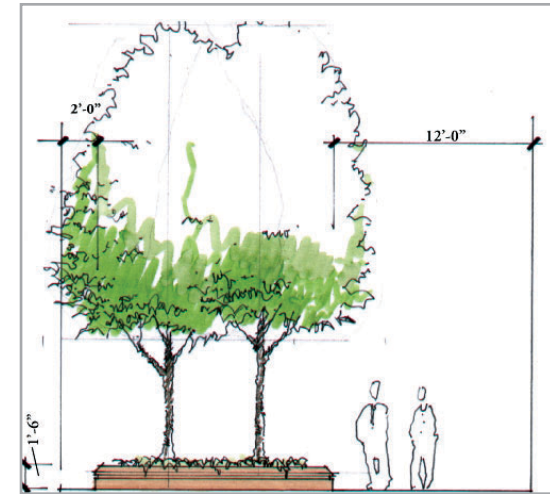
5th Street Streetscape: Typical Sidewalk Plans
